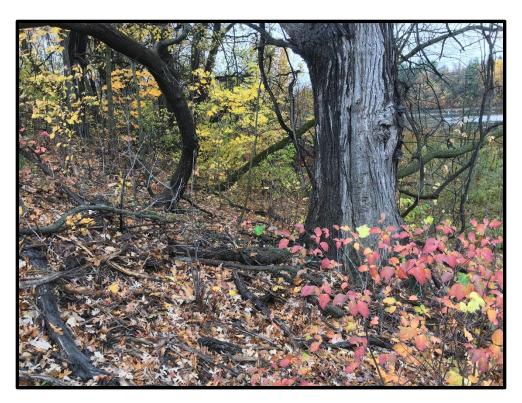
Existing conditions of western slope face, looking upslope, facing east. (October 16, 2020)
